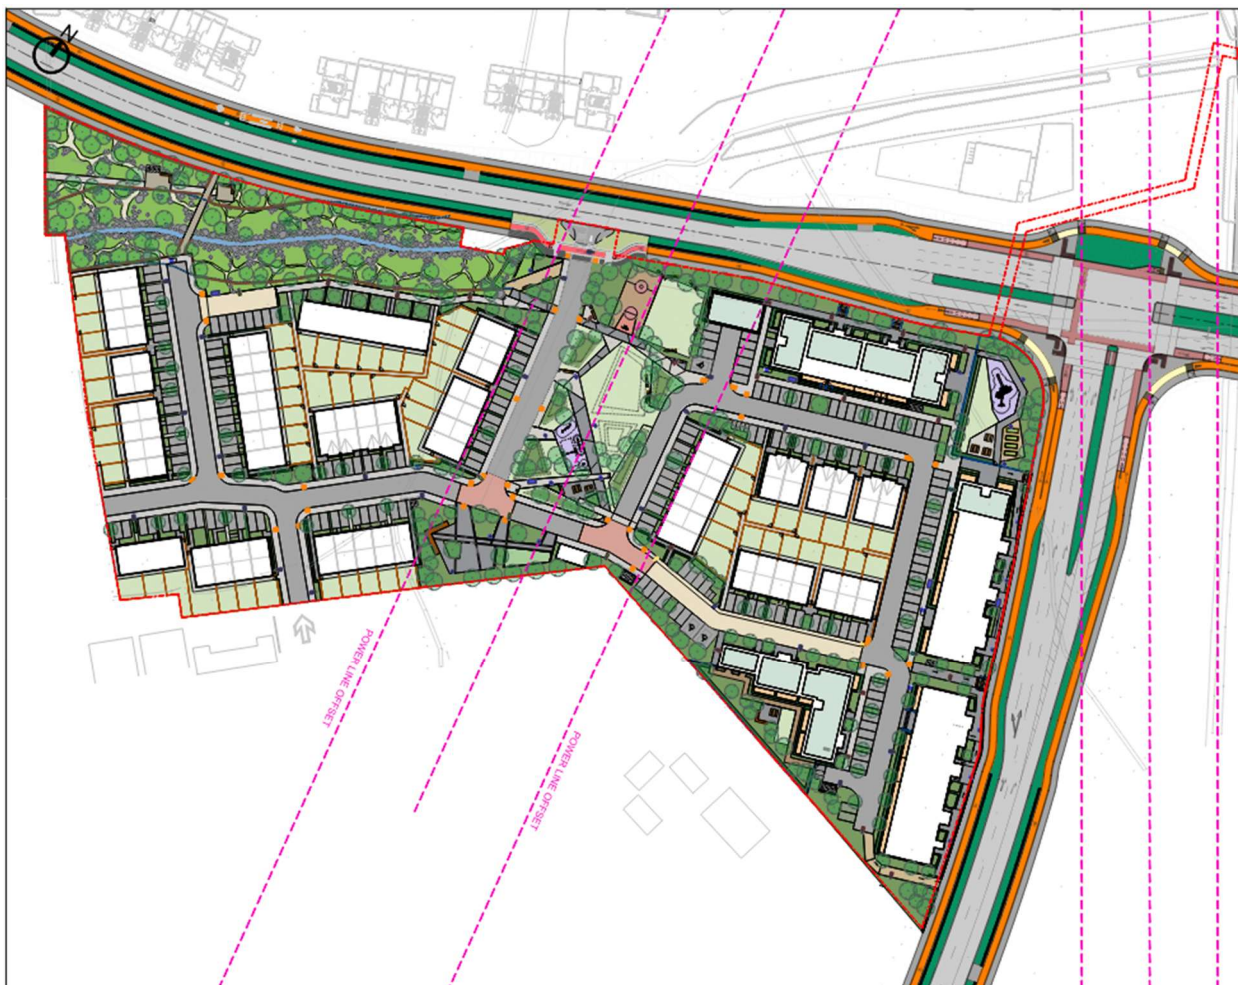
Proposed Site Layout Plan (Source: MCORM Architecture & Urban Design)
